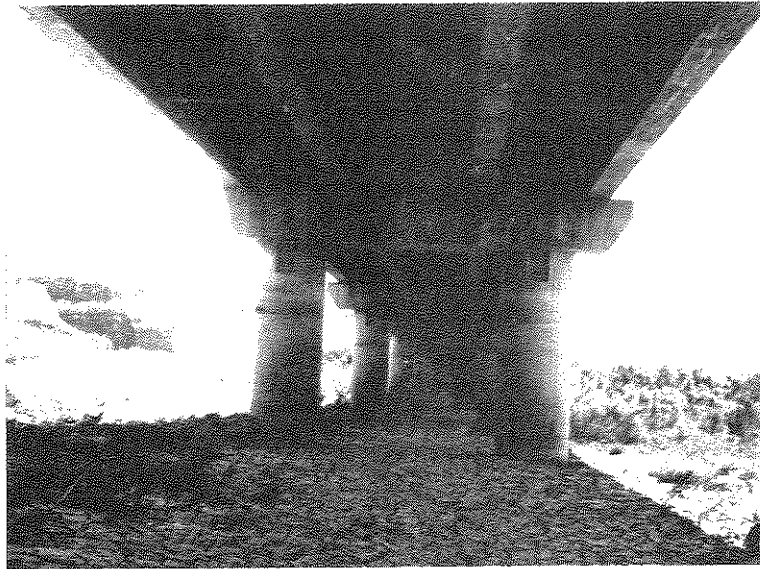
Concrete bridge with large lateral pier displacement appears to be undamaged
